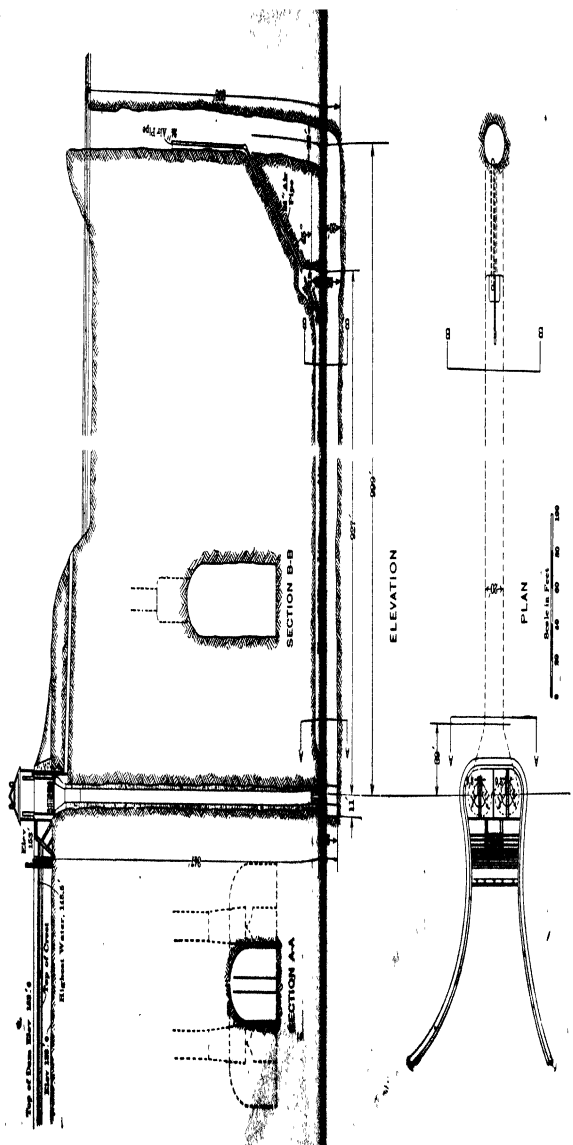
Cobalt Power Co's Plant, Plan and Elevation.
